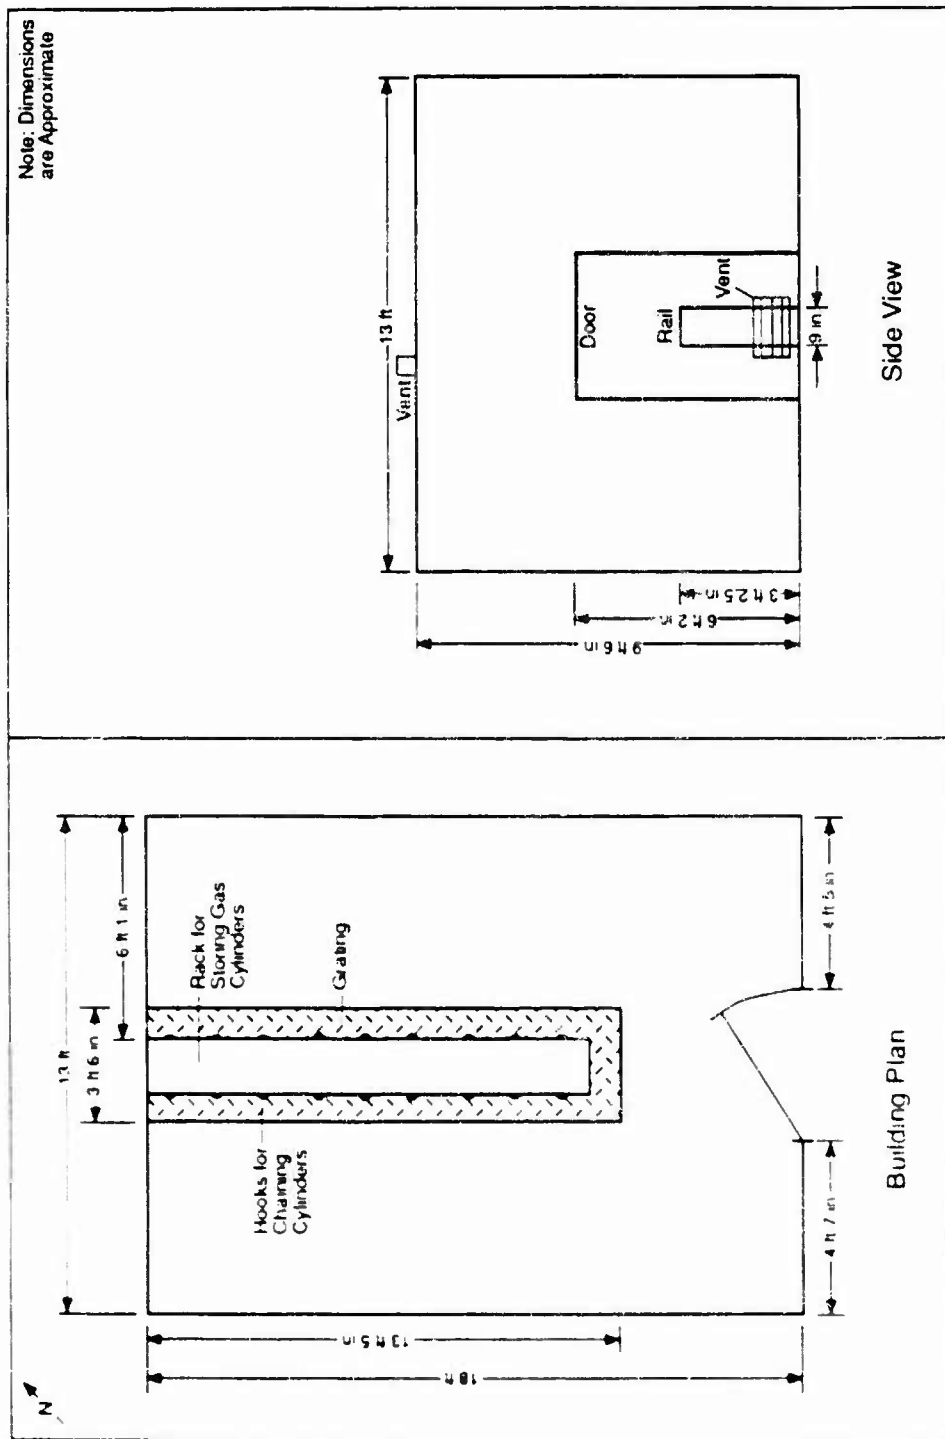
Floor Plan and Side View of Building 3045 (Source: Adapted from Foster Wheeler 1988a)
